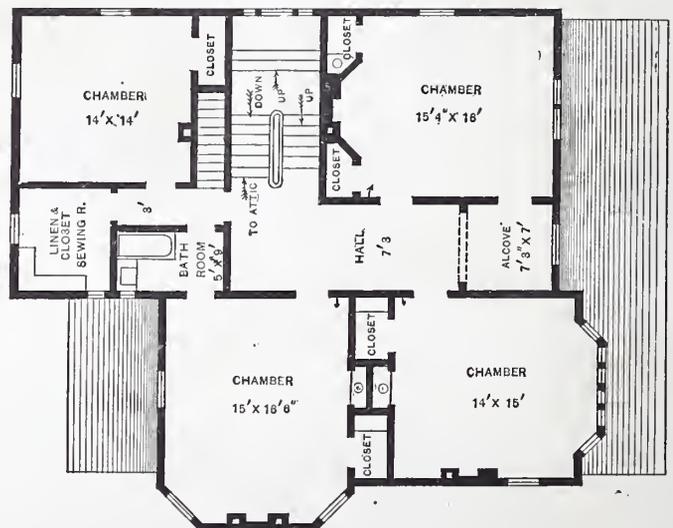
Second Floor Plan.—Scale, 1-16 Inch to the Foot.
